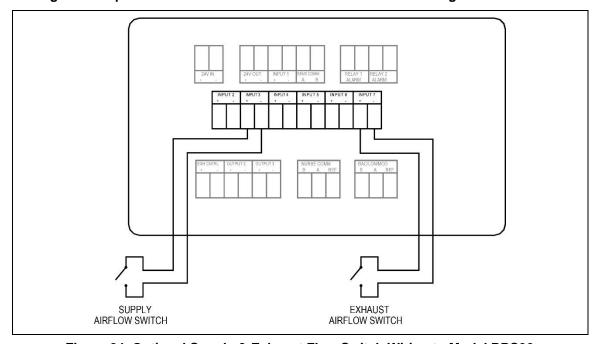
Optional Supply & Exhaust Flow Switch Wiring to Model RPC30
